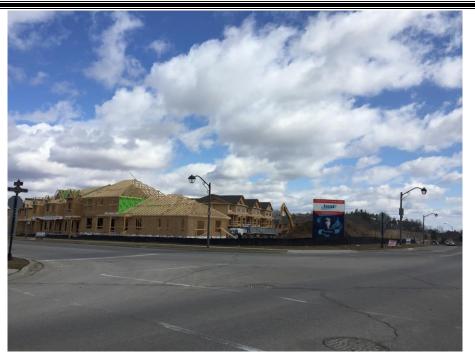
Townhouses from intersection of Blackburn Drive and Diana Avenue
